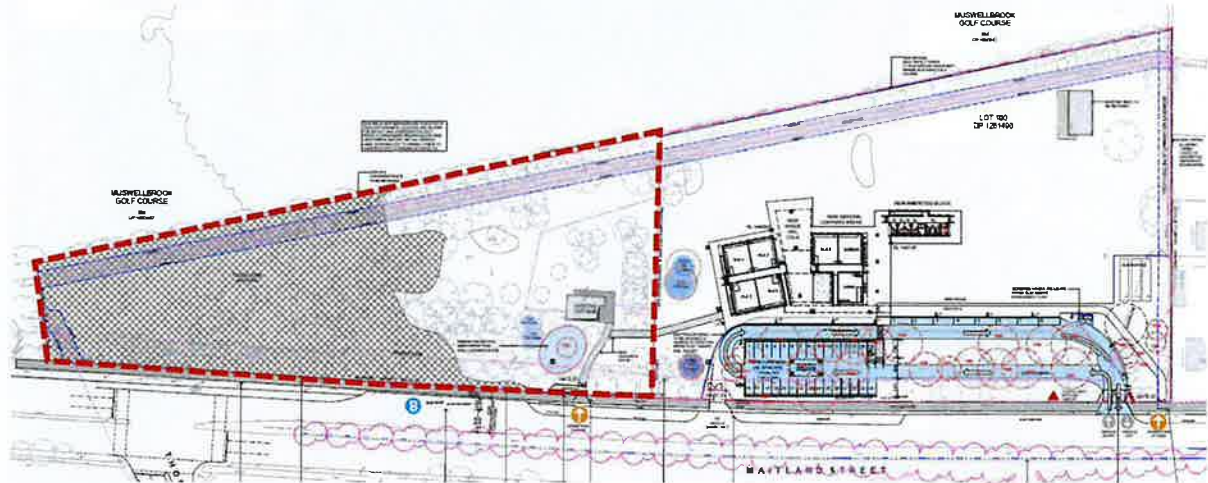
Extract of proposed site plan with the northern portion of the site identified in red (Source: NBR Architecture)
